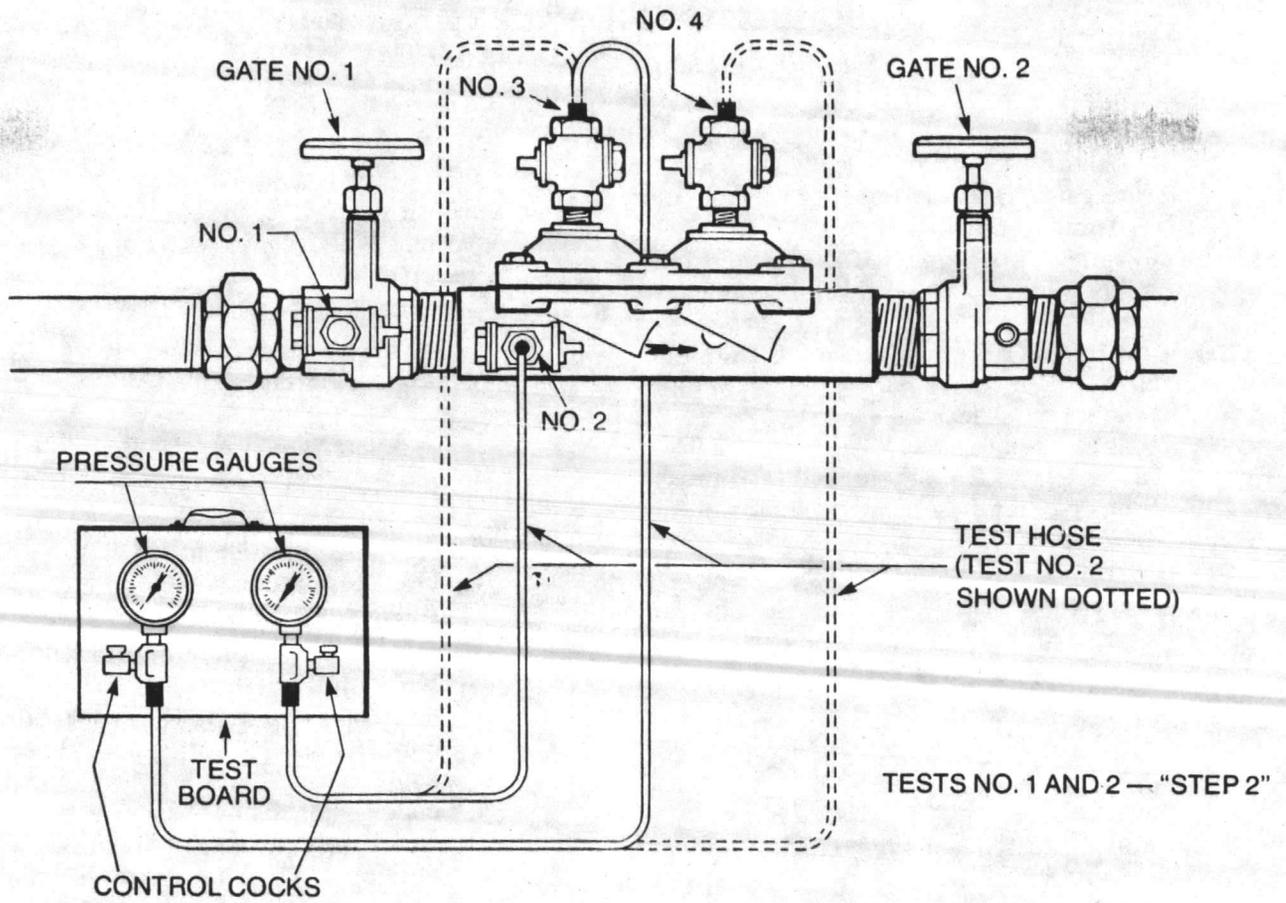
PRESSURE GAUGES INSTALLED ON FDC DOUBLE CHECK VALVE ASSEMBLY
